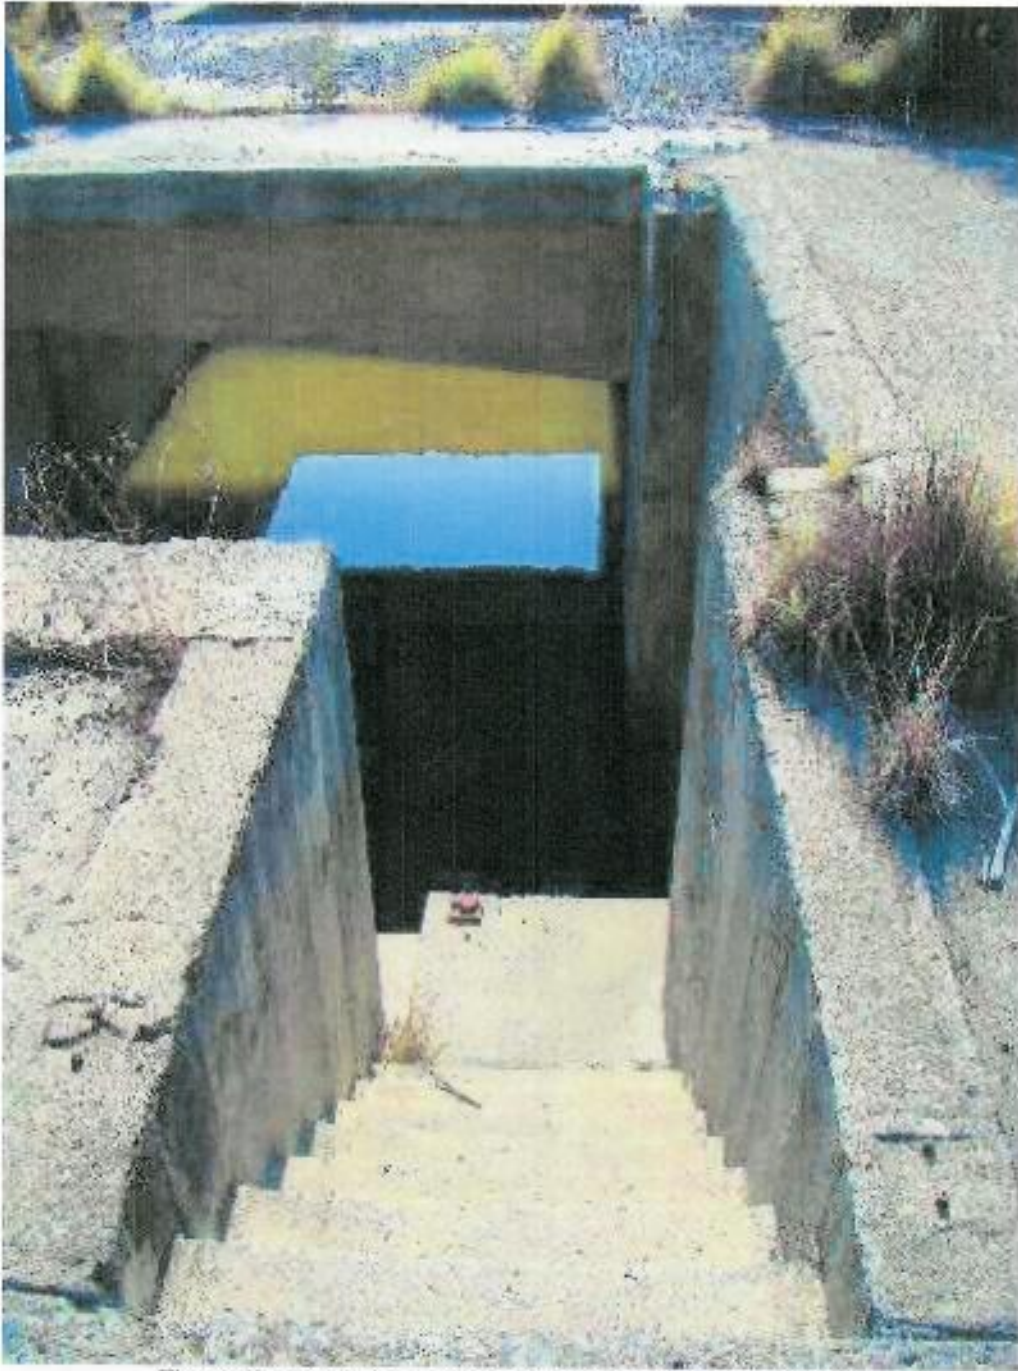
Detail of above-ground structures at Washing Plant (2)
